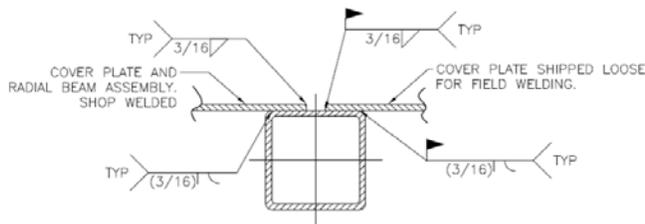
Typical Weld Detail for Radial Beam Connections
